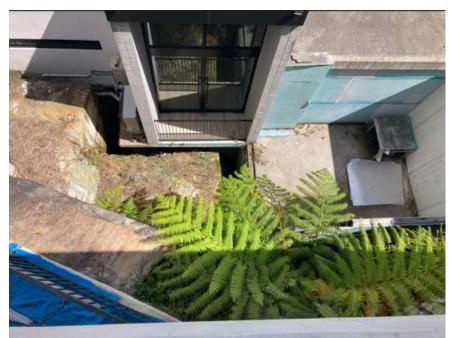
Looking from the top of the cliff straight down towards the rear of the secondary dwelling fronting Griffith Avenue
